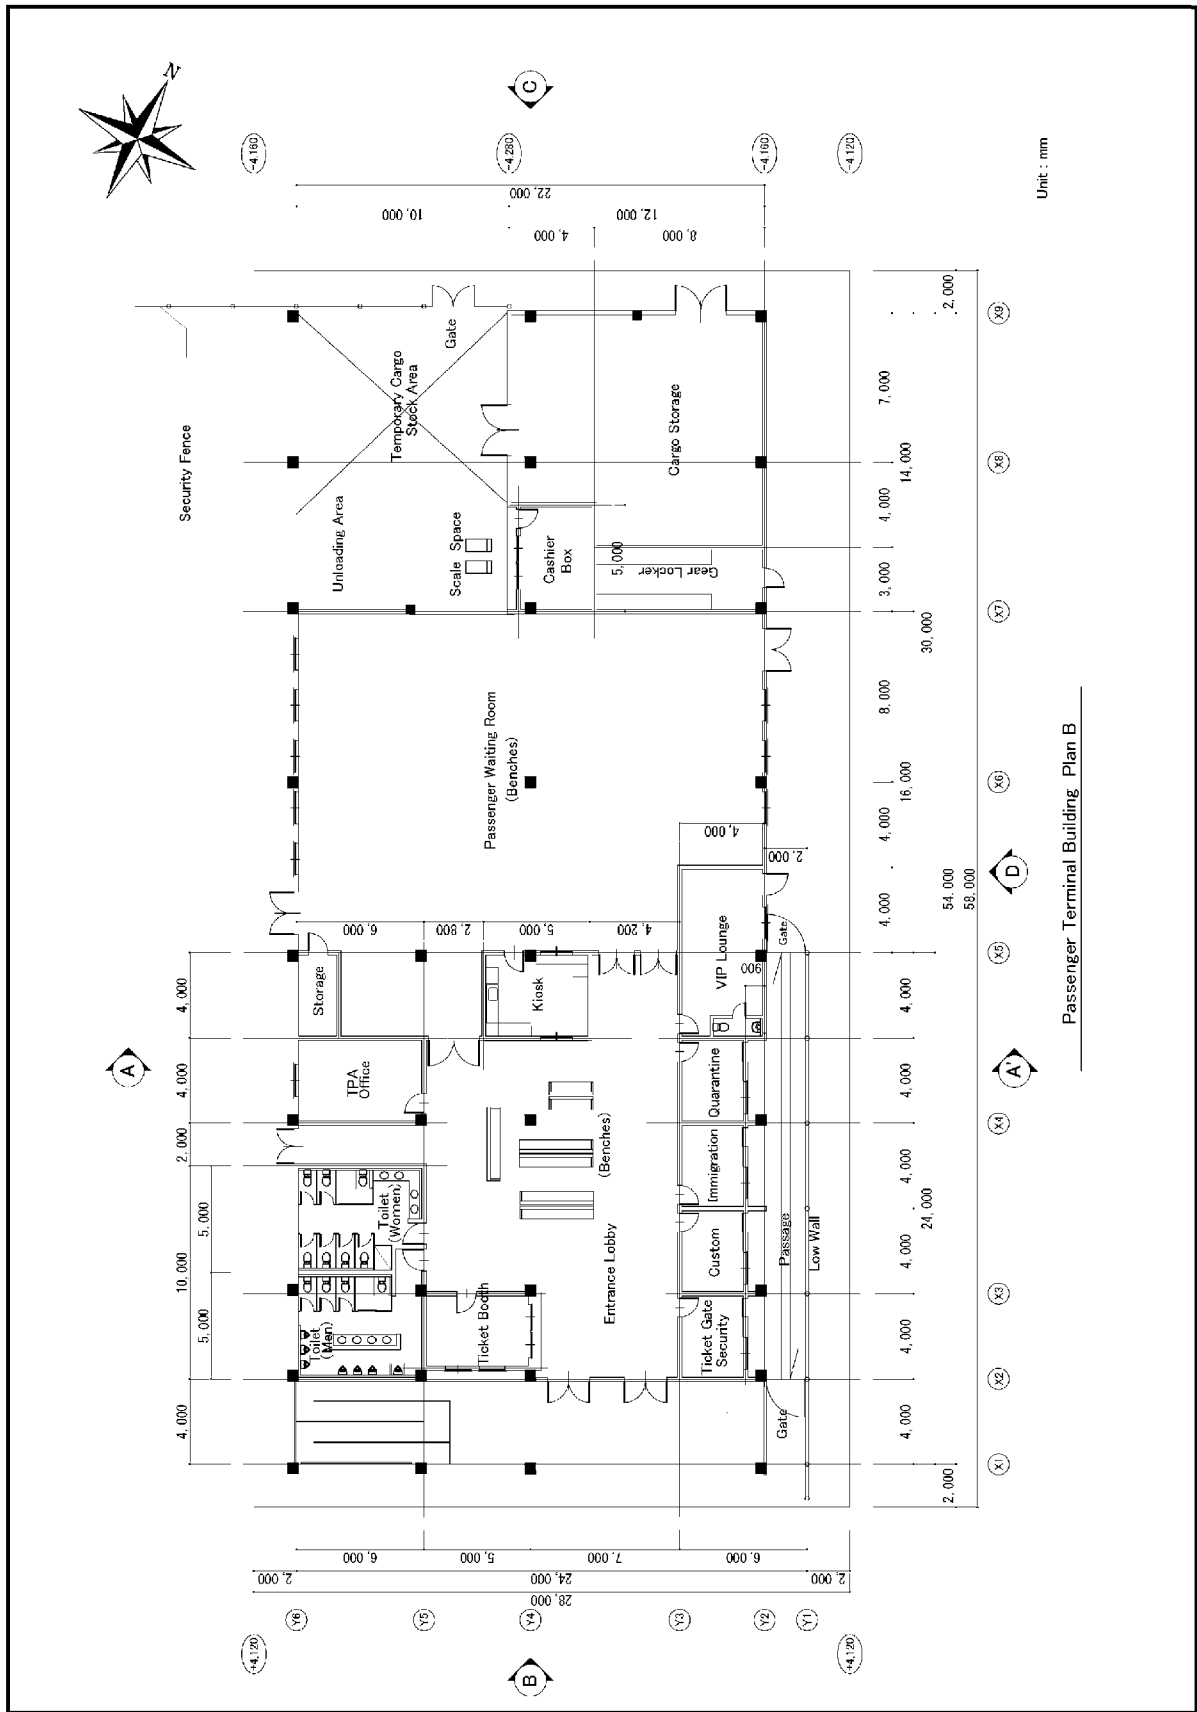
Layout Plan of Passenger Terminal Building
